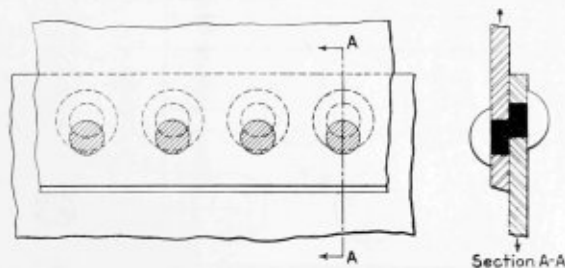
(a).—Rivet Failure by Single Shear
